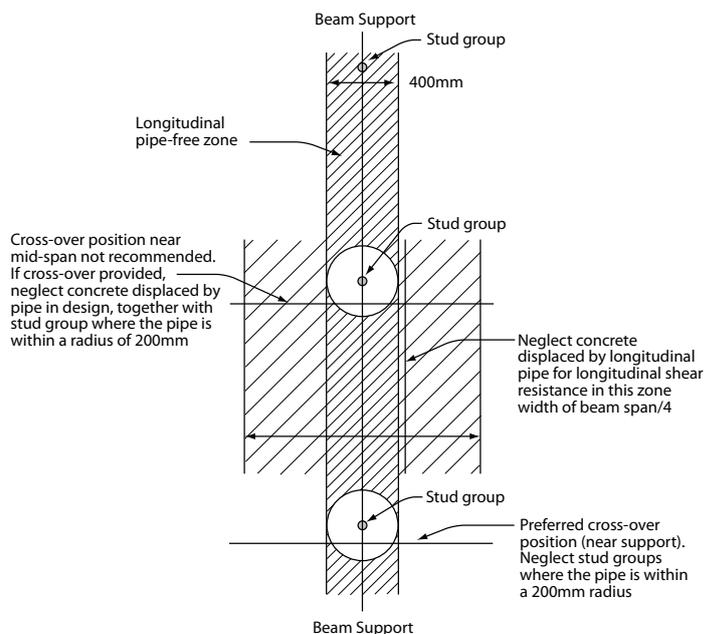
Recommendations for pipe positioning and implications for design for composite beams with 100 mm high stud shear connectors
